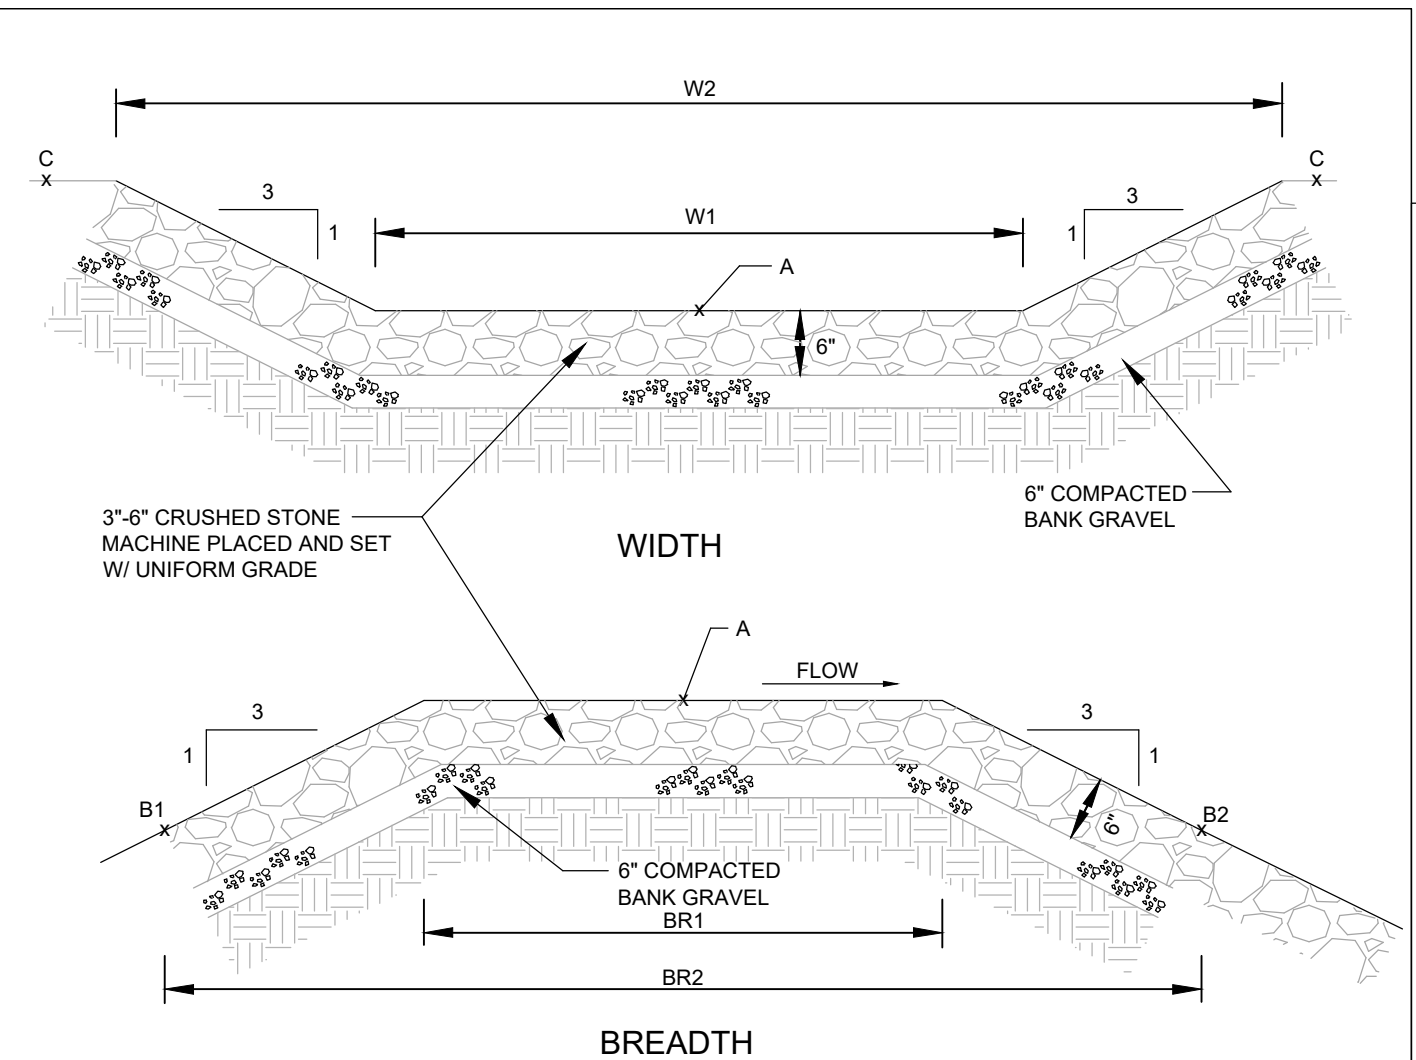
TYPICAL DETAIL FOR ROCK OUTLET PROTECTION
